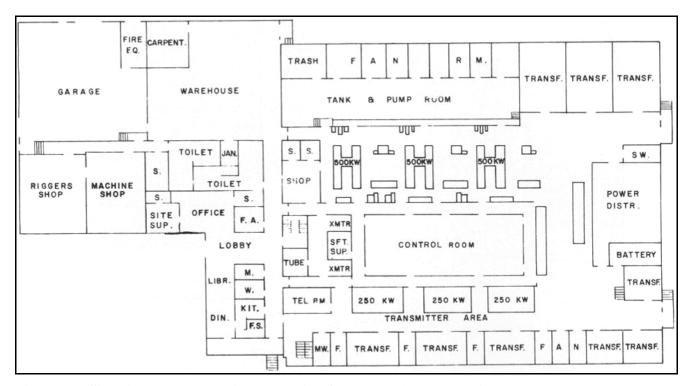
Sites A and B transmitter building floor plan (source: Rhine 1968)
